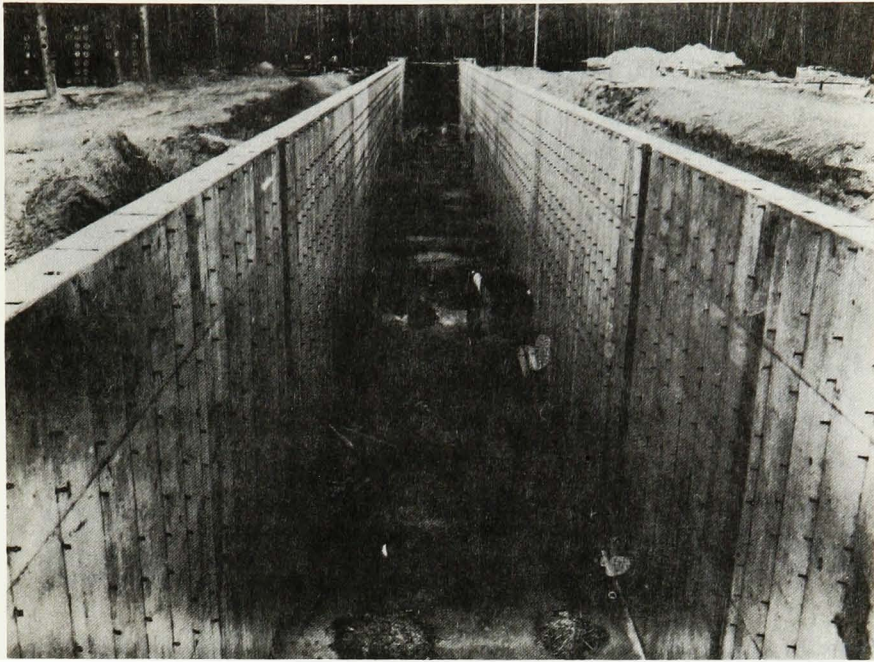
View looking down the 20-foot-deep, 635-foot tank toward area where generator will be located. On the right, shore processes test basin is under construction.
